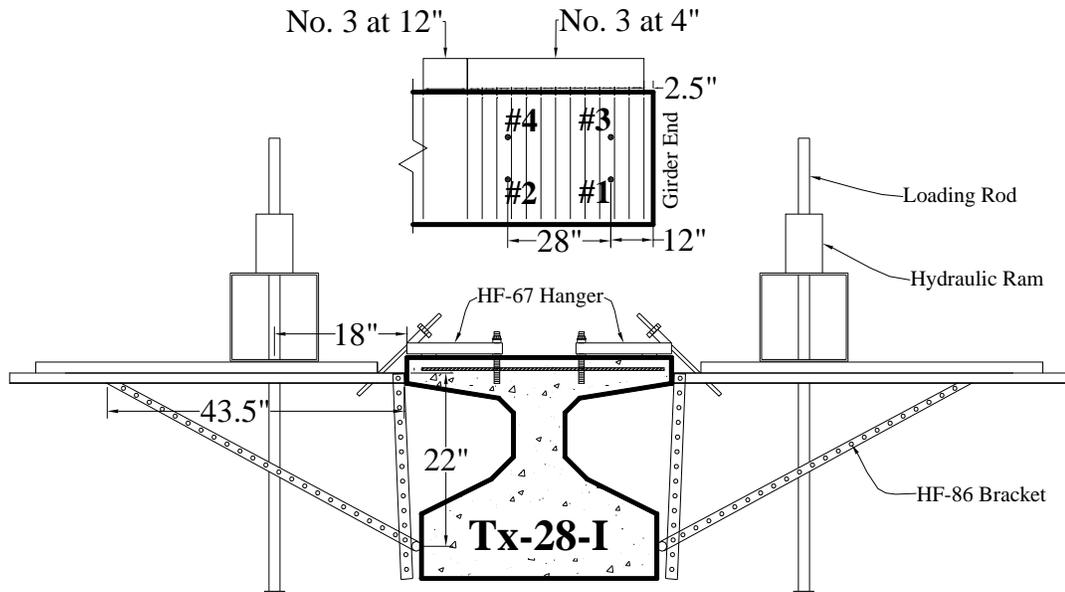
Reinforcement pattern and loading geometry for HF-67 on Tx-28-I
